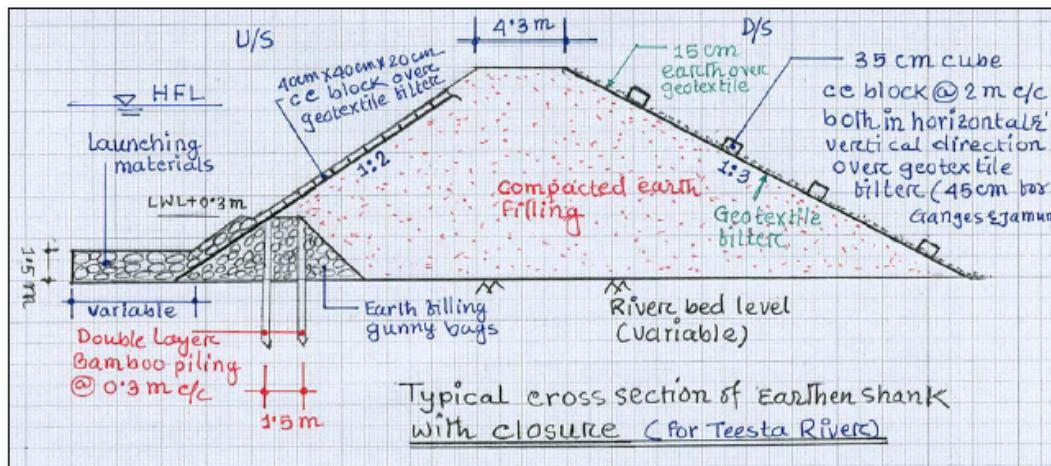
Typical cross section of river closure (Source: Uddin 2007)
